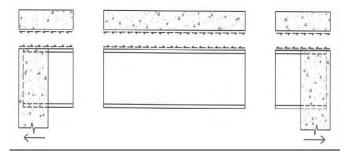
Shrinkage –induced stresses in a steel girder built integrally with the concrete deck and abutments
